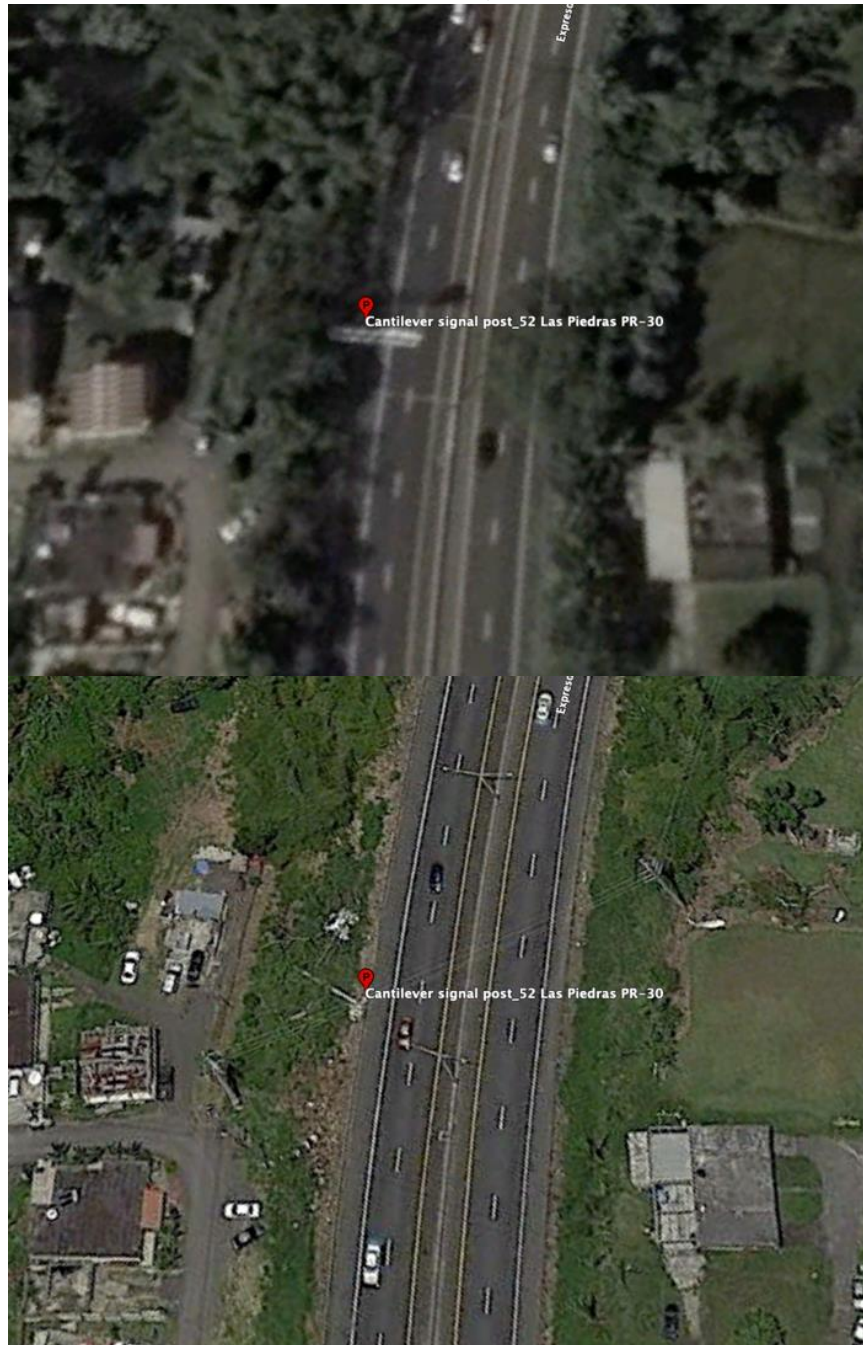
Cantilever Sign Post 52 Located in Las Piedras (Picture 1: 1/2014, Picture 2: 4/2018)
